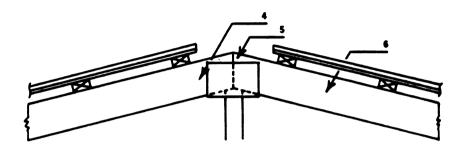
Location of test sites, Barn J. Truss No. 2, 31.6m (104') from east end. West elevation. Flashing not shown
